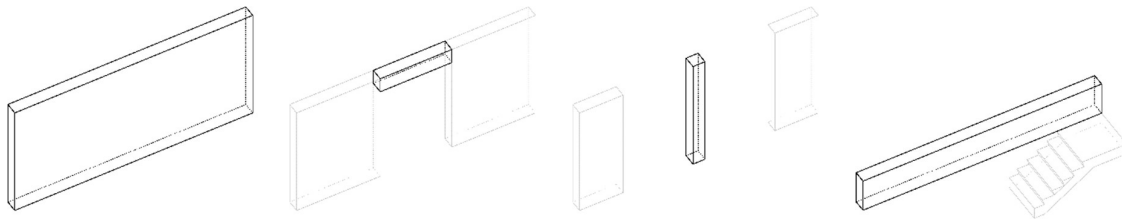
A wall and various elements typically drawn as walls that could also be characterized differently, as Beam, Column and Railing
